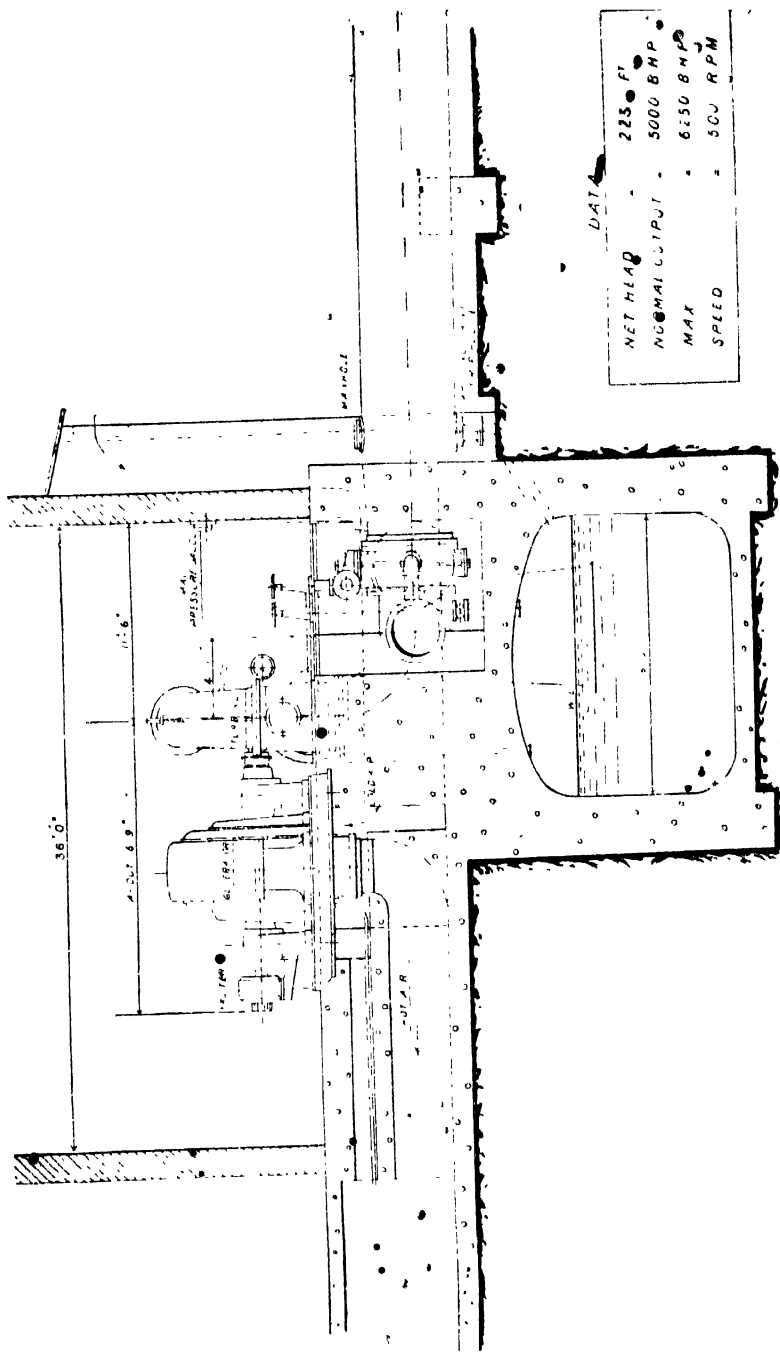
Single Spiral Turbine forming a Two-bearing Unit
